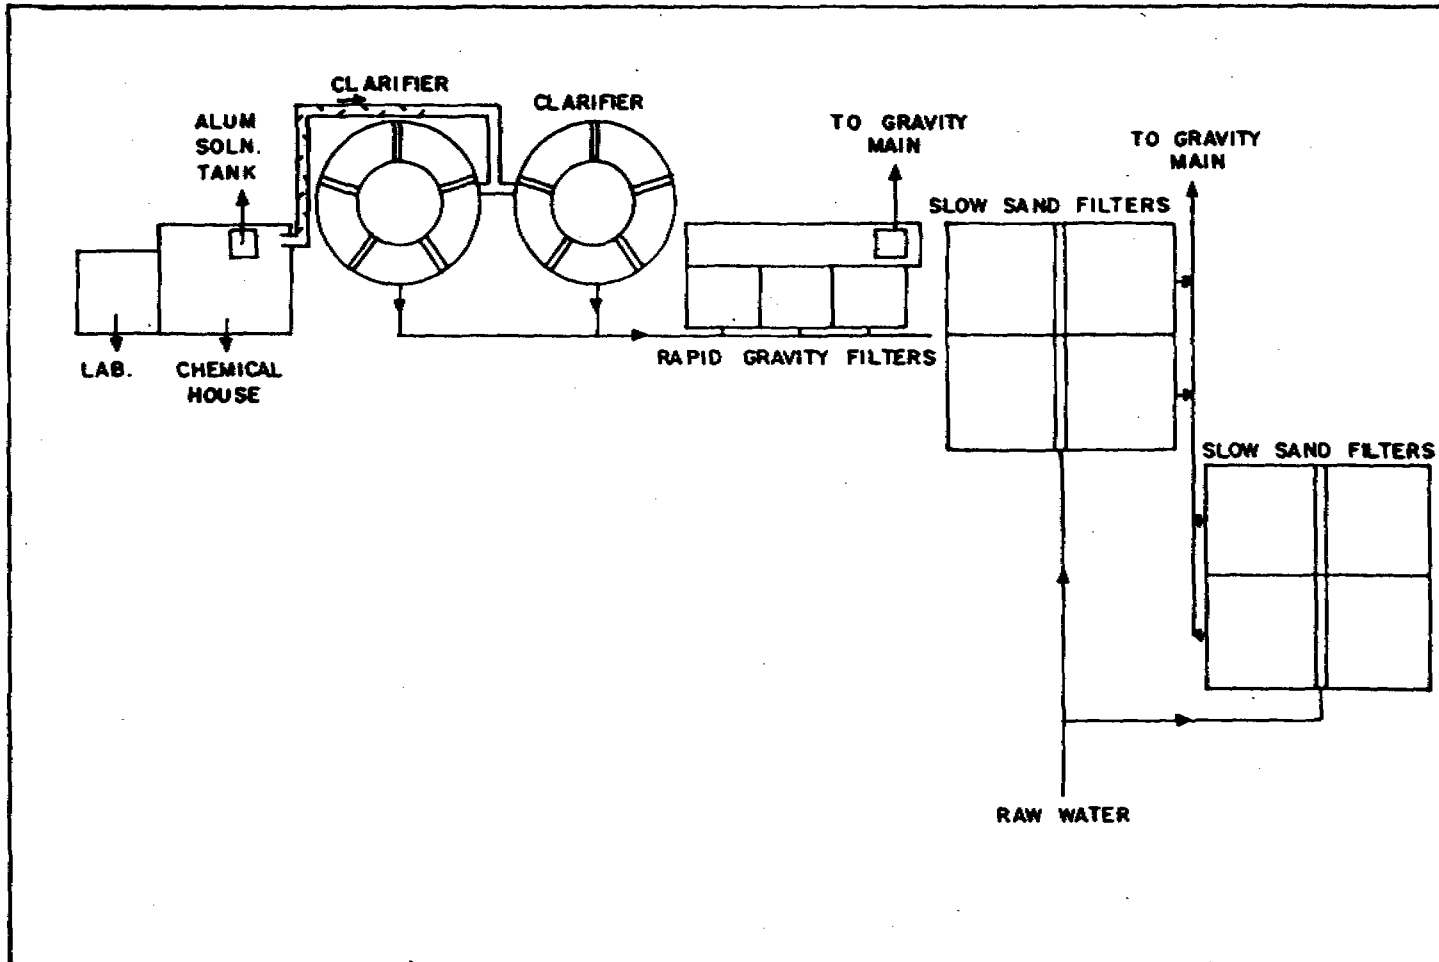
LAYOUT PLAN OF DHALLI WATER WORKS, SHIMLA
